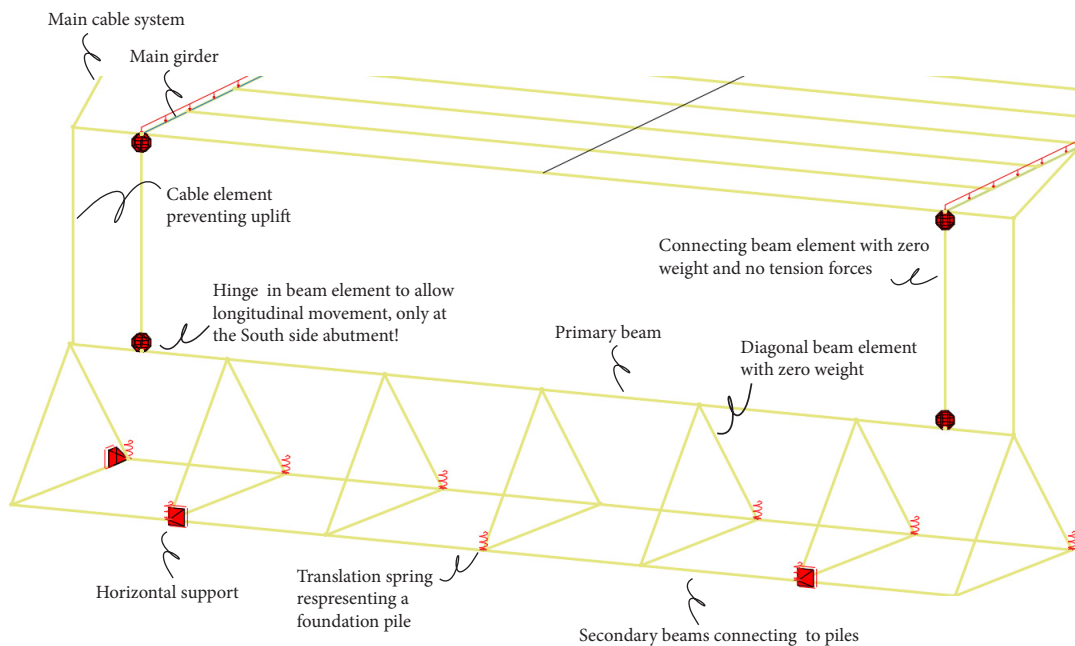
Wireframe model of the abutment foundation modelled in FEM
